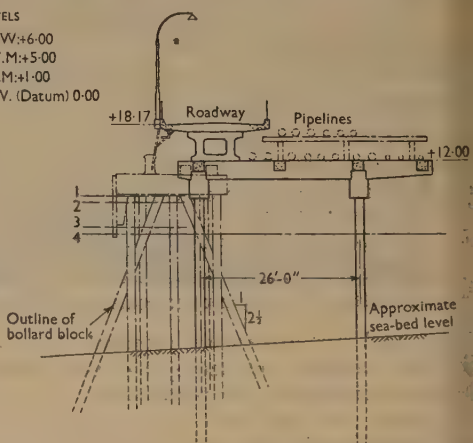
CROSS-SECTION THROUGH TRUNKWAY
